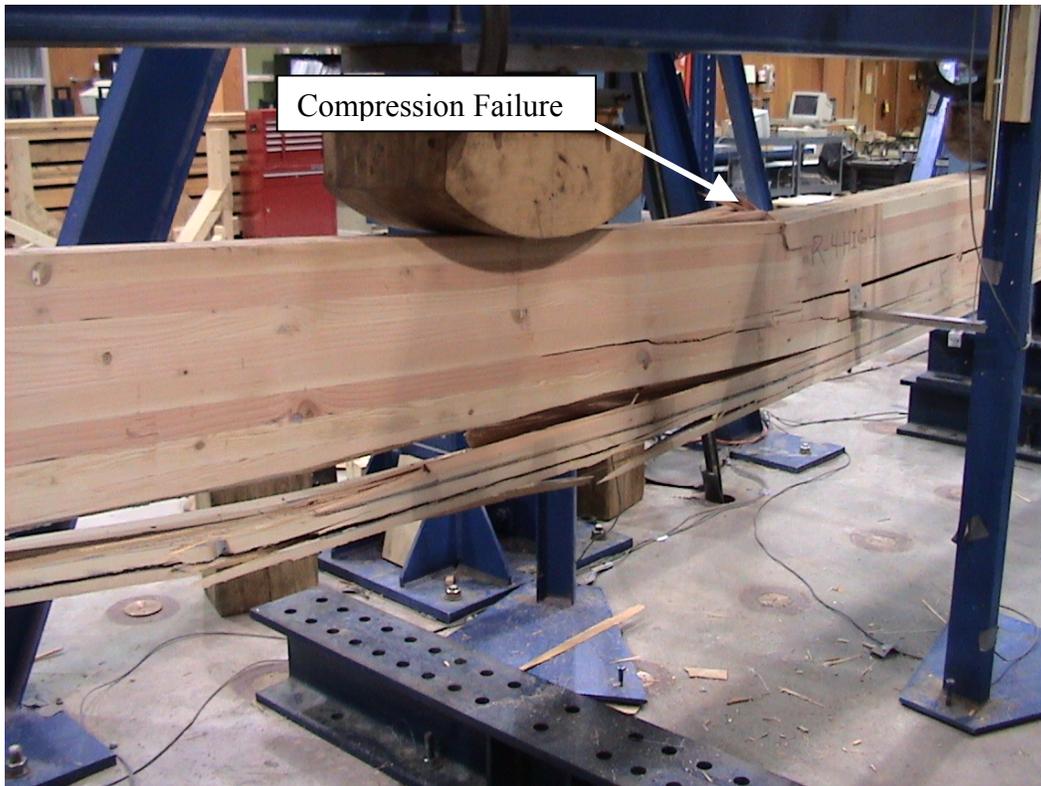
Hardwire Reinforced Beam R-4 - Note Compression Failure on the Wood
